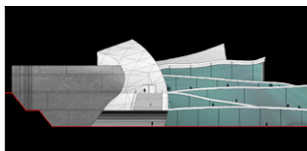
EAST ELEVATION: DIGITAL EXTRUSION LANDSCAPE
